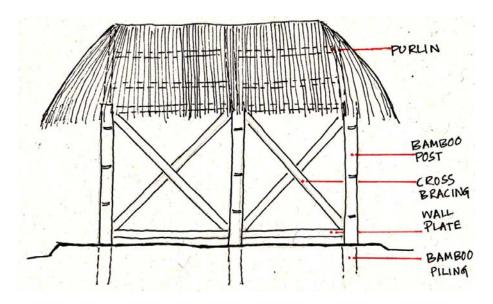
Elevation of a cow and goat shed showing cross bracing (Source: Author 2013)
